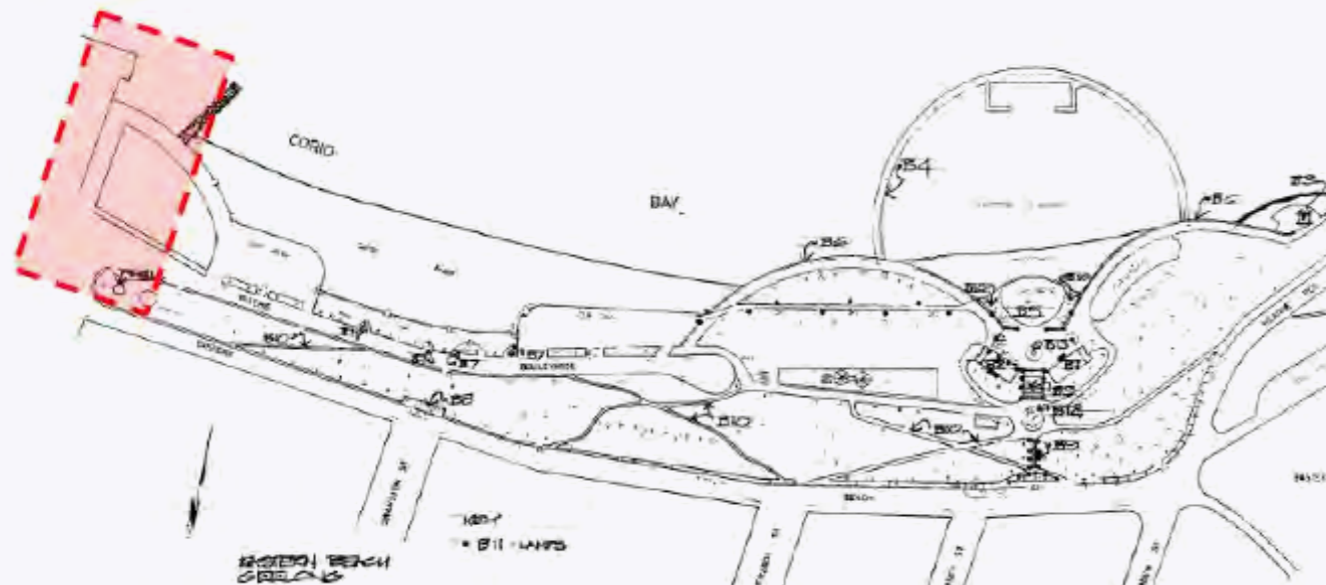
Plan H0929. Highlighted section shows the extent of the project area within the heritage area
